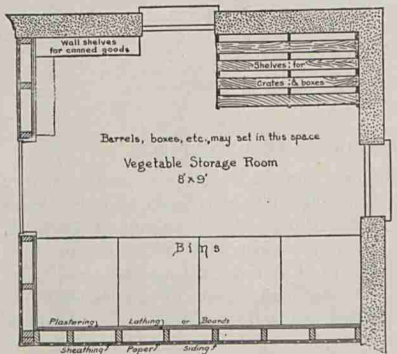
Floor plan of a storage room in a corner of a basement. The arrangement of the shelving and bins may be changed to suit conditions. While the construction of the wall may be varied, it must be tight.
